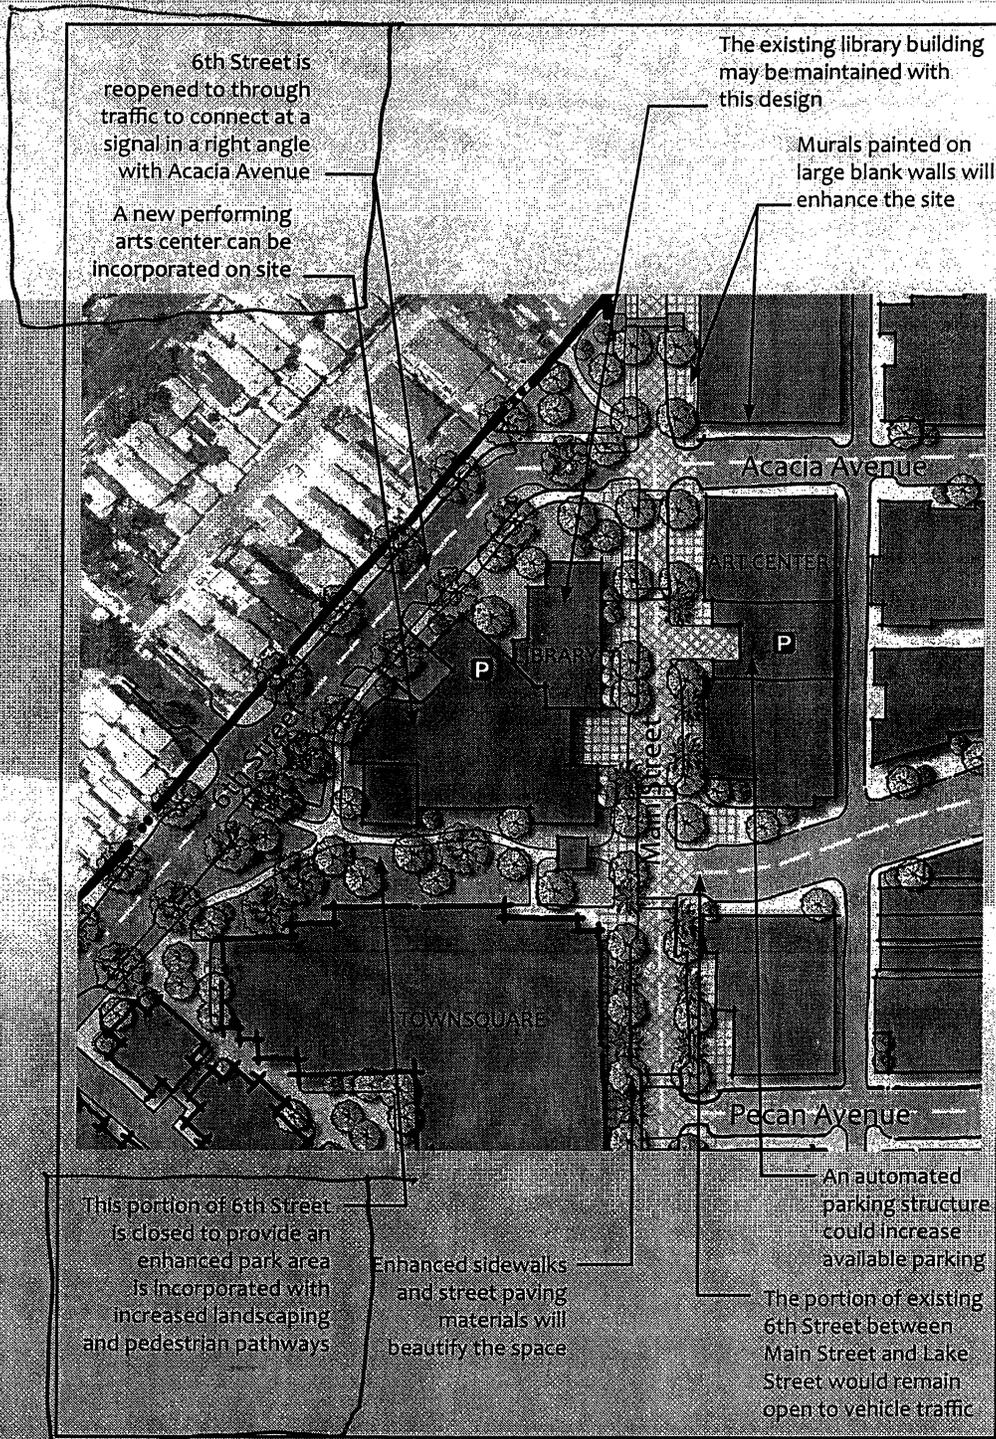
A new cultural arts plaza is proposed for the north end of Main Street
